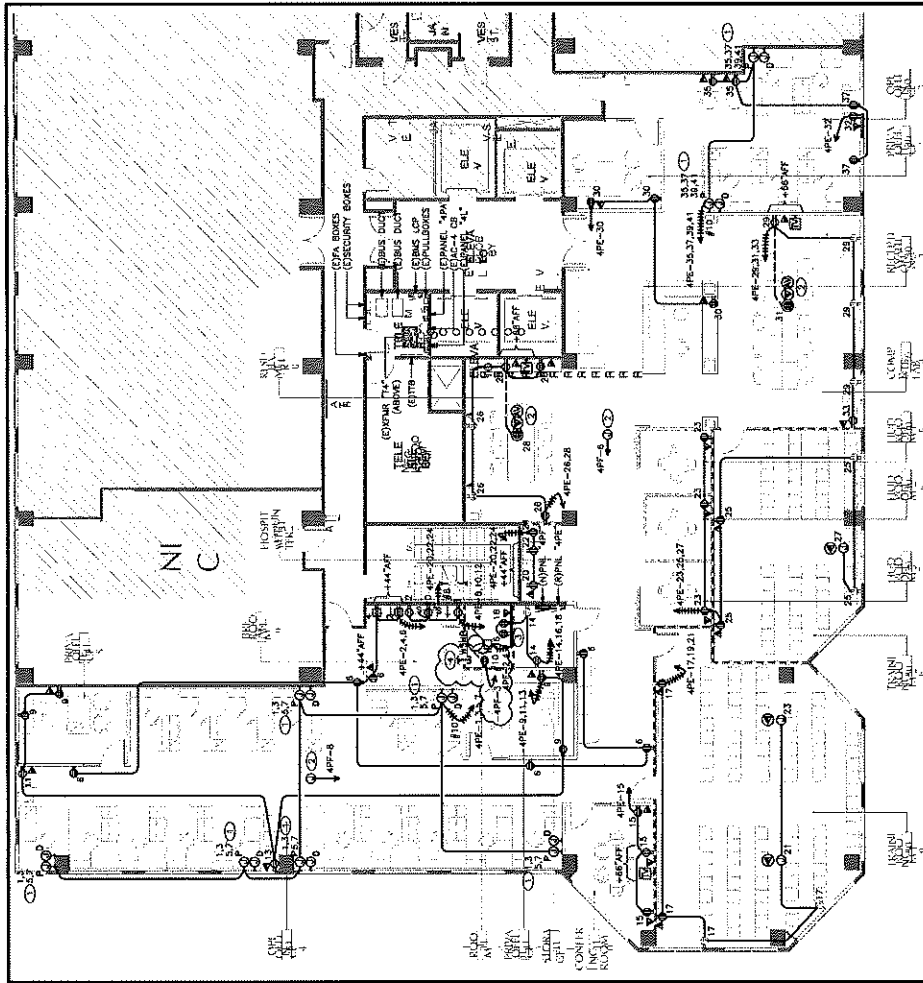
EXHIBIT A - SAMPLE PROJECT PROPOSAL, FLOOR PLAN 2
